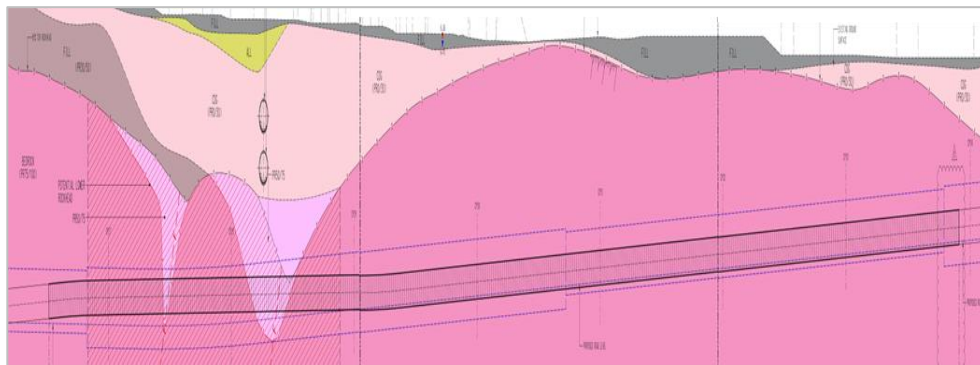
Geological profile of SFRC tunnel lining section in Central Kowloon Route Project
